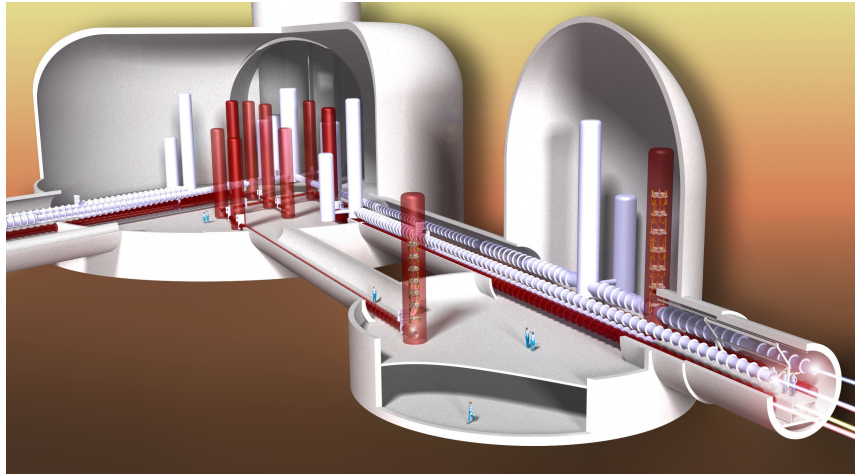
Artistic impression of the underground arrangement of tunnels and caverns. For details see sections 3.7.3 and 3.7.2
